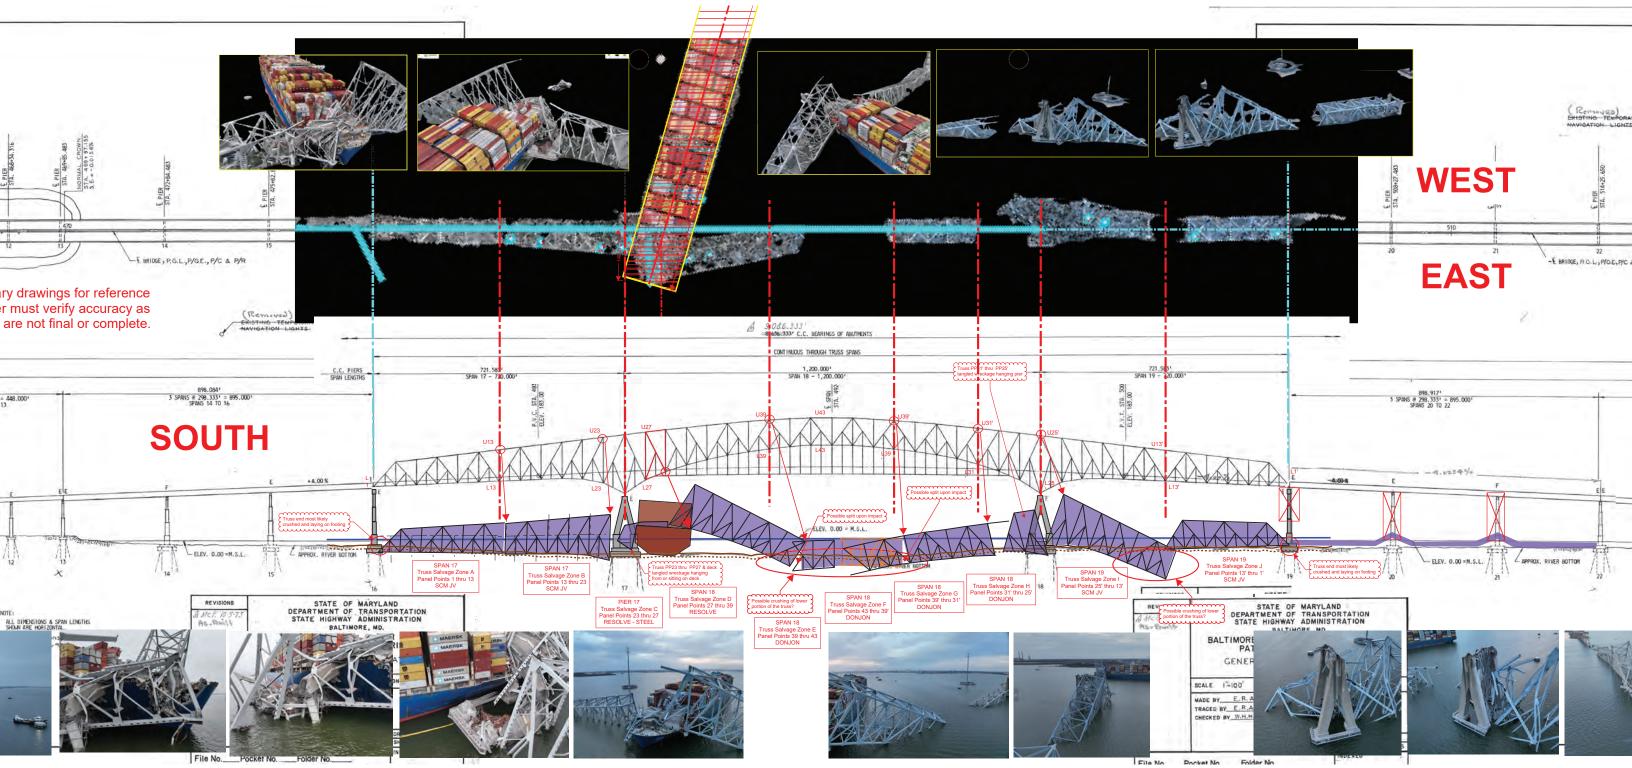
A drawing showing M/V Dali aground on pier 17, and an early assumption of where the truss sections lay in the three bridge central spans.
